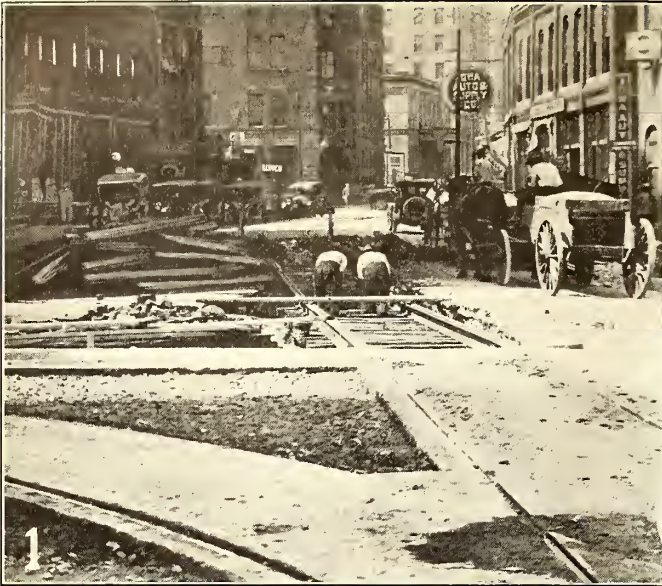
Granite block paving all the way across between rails. Fig. 2—Installing special work at West Ninth Street and Grand Avenue. Fig. 3.—City paving work under way in conjunction with track construction. Fig. 4.—Pouring concrete base, leaving space
